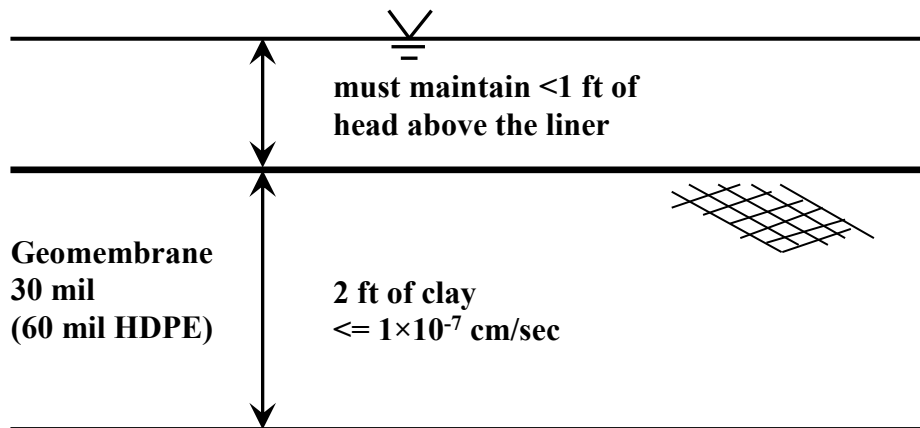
Cross-Section of a Composite Liner adapted from [7]
